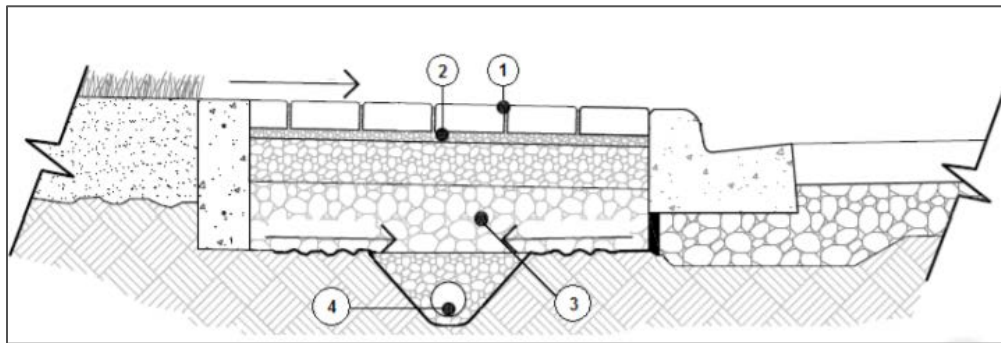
Typical Layout of Permeable Pavement (Source: City of Edmonton).
